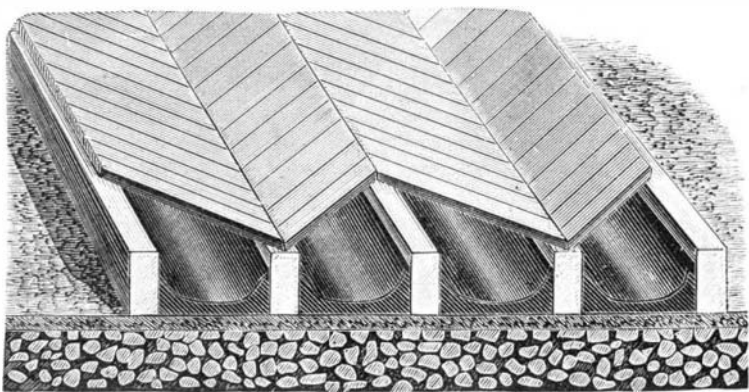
JOISTS AND FLOOR UPON A FOUNDATION OF BITUMEN AND CONCRETE.
